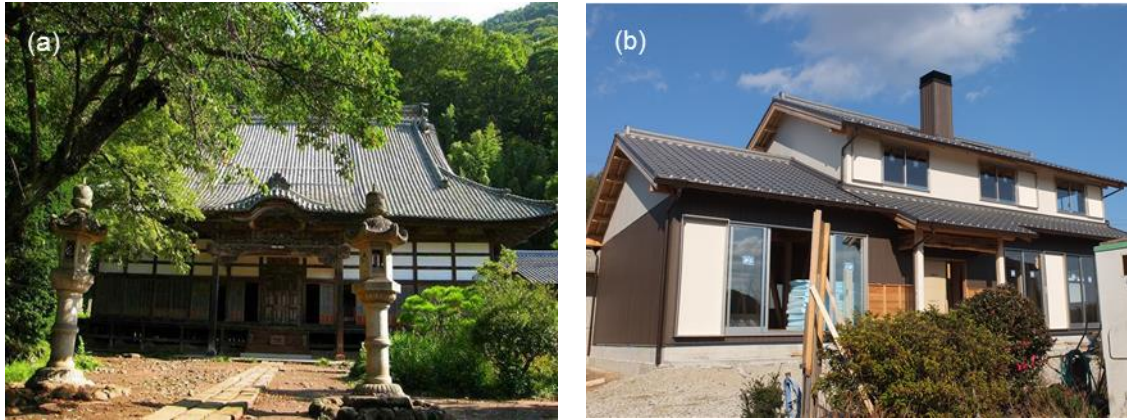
Post and beam wooden structures in Japan. (a) Traditional post and beam structure. (b) Conventional post and beam structure.
